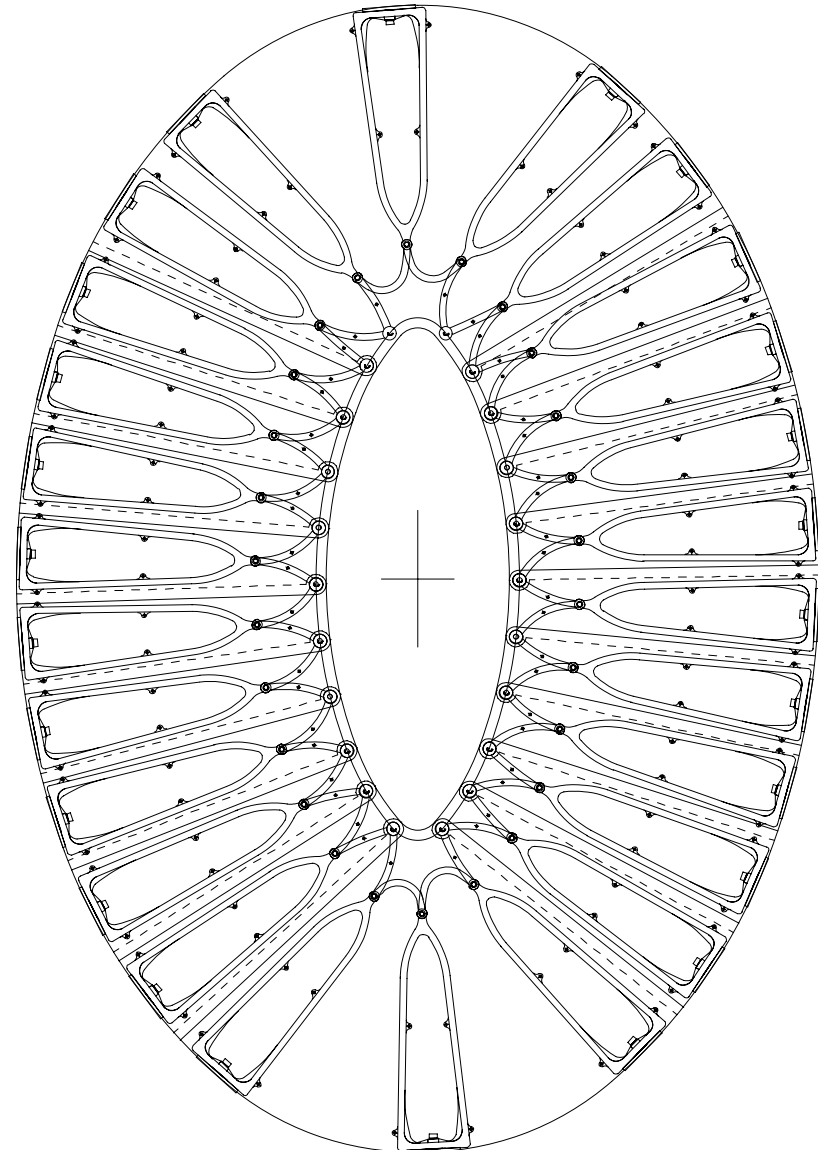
Cast aluminium and maple stair in Tudor House, architect Knox Bhavan, 2003
